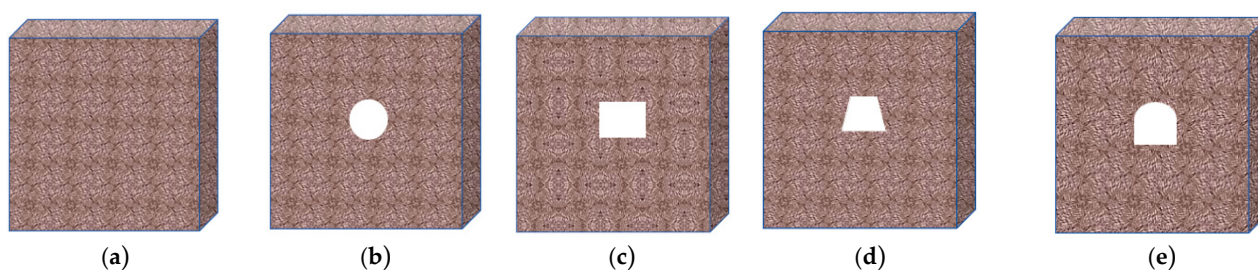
Prefabricated roadway cross-section morphology sandstone specimen. (a) Complete rock sample; (b) orbicular; (c) rectangular; (d) trapezoidal; (e) straight-wall domed form.
